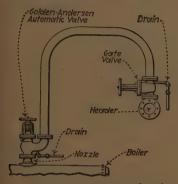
Boiler steam-outlet pipe in form of U-bend.
